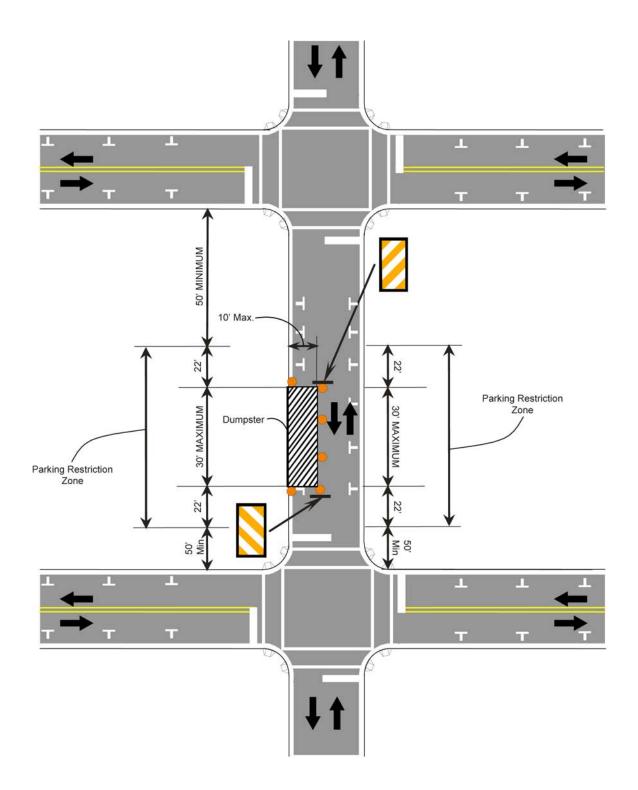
Typical Application: Construction Dumpster Located in Parking Lane (Two-Way Road)
